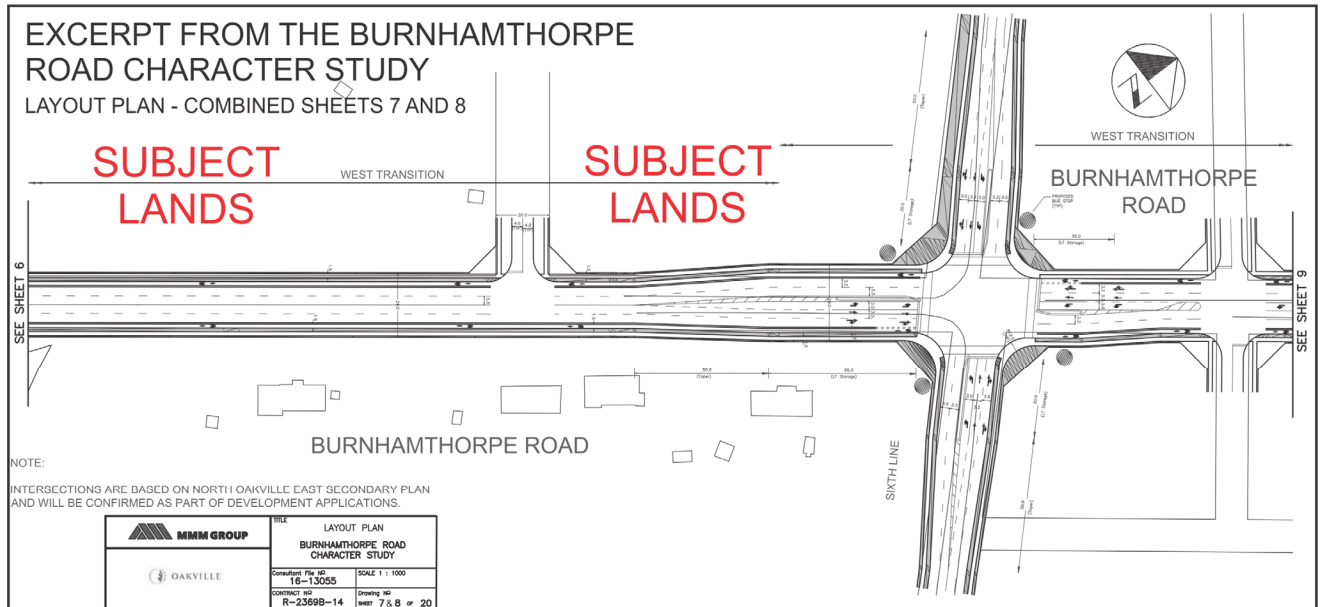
Excerpt of the Burnhamthorpe Road Character Study & Class Municipal Assessment – Appendix F – Preferred Design – Layout Plan
